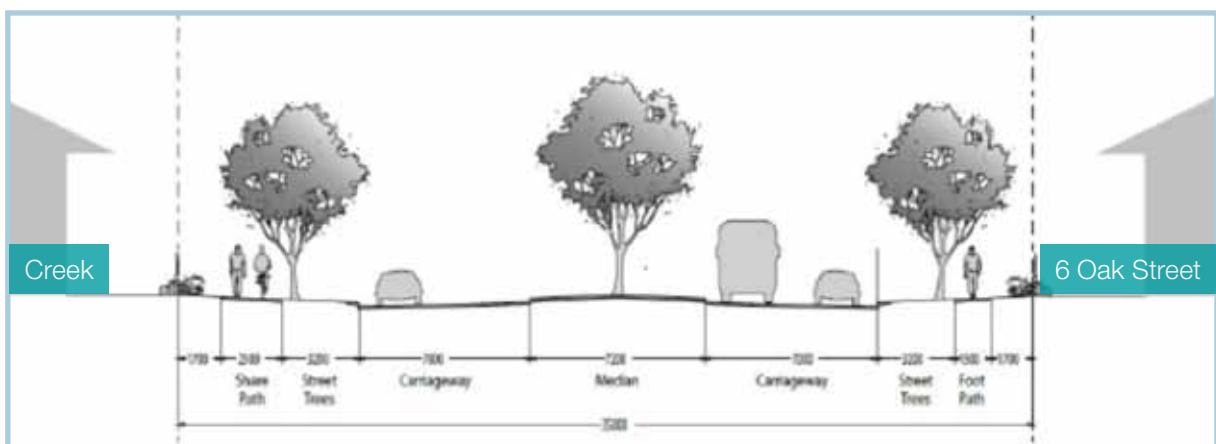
Clark Street will be a 4 lane Sub Arterial, limiting access to Creek from 6 Oak Street
